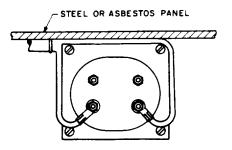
Transformers — Small Service — No. 14 Gauge and Smaller Wires
